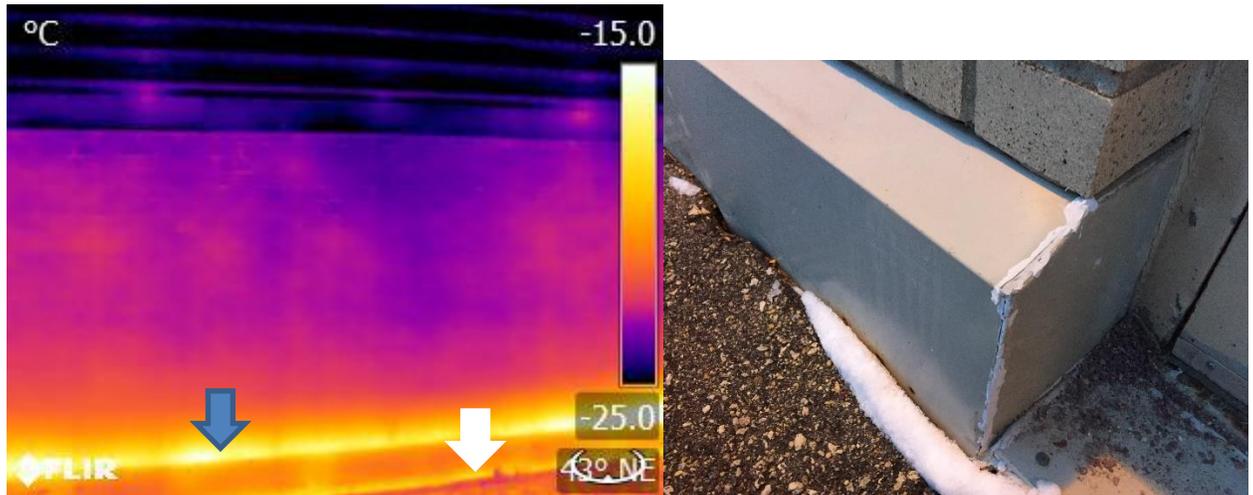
Thermal anomaly at the intersection of the brick cladding and foundation wall (blue arrow). Note that this thermal anomaly is located at the intersection of the top of the foundation wall and brick cladding and not at the intersection of the foundation wall and grade (white arrow). Also note that insulation and metal flashing is installed outboard of the foundation wall below the brick cladding.
